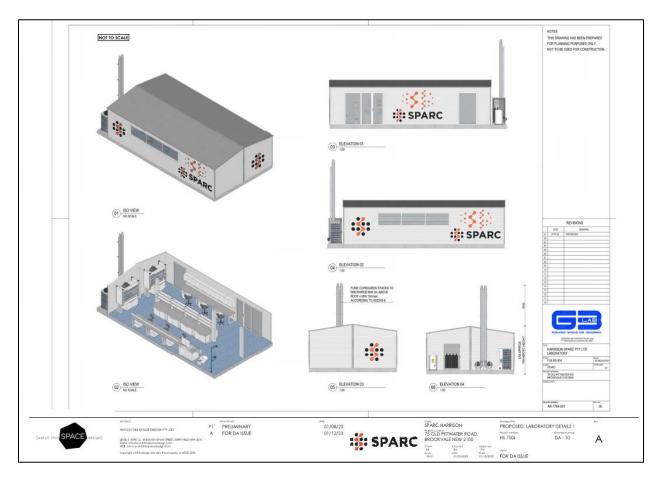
Proposed Laboratory Details (Source: Watch This Space Design Pty Ltd, December 2023)
